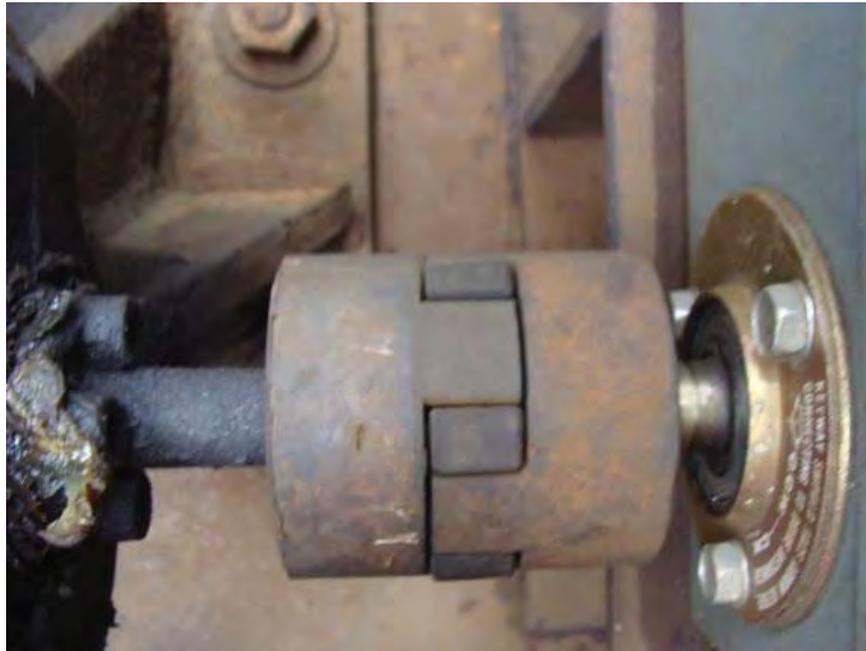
North Leaf, Span Lock Instrumentation Coupling.
